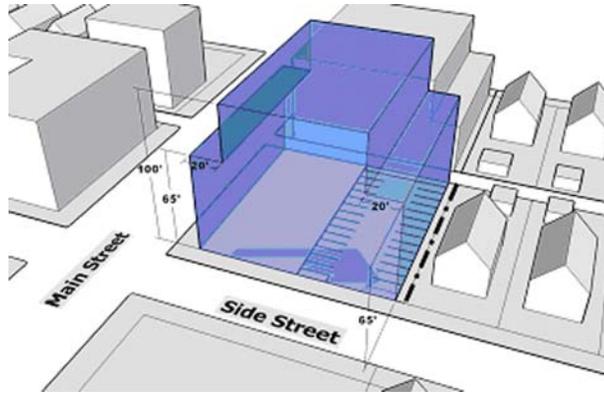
Maximum Building Height and Upper Story Setbacks (MS-3)
